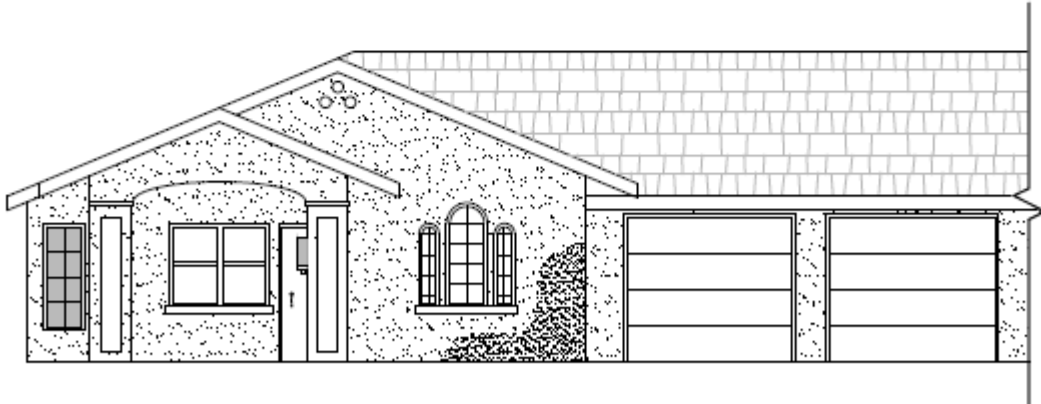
Conceptual Exterior Elevation - Plan 1 – Alternatives A and B
